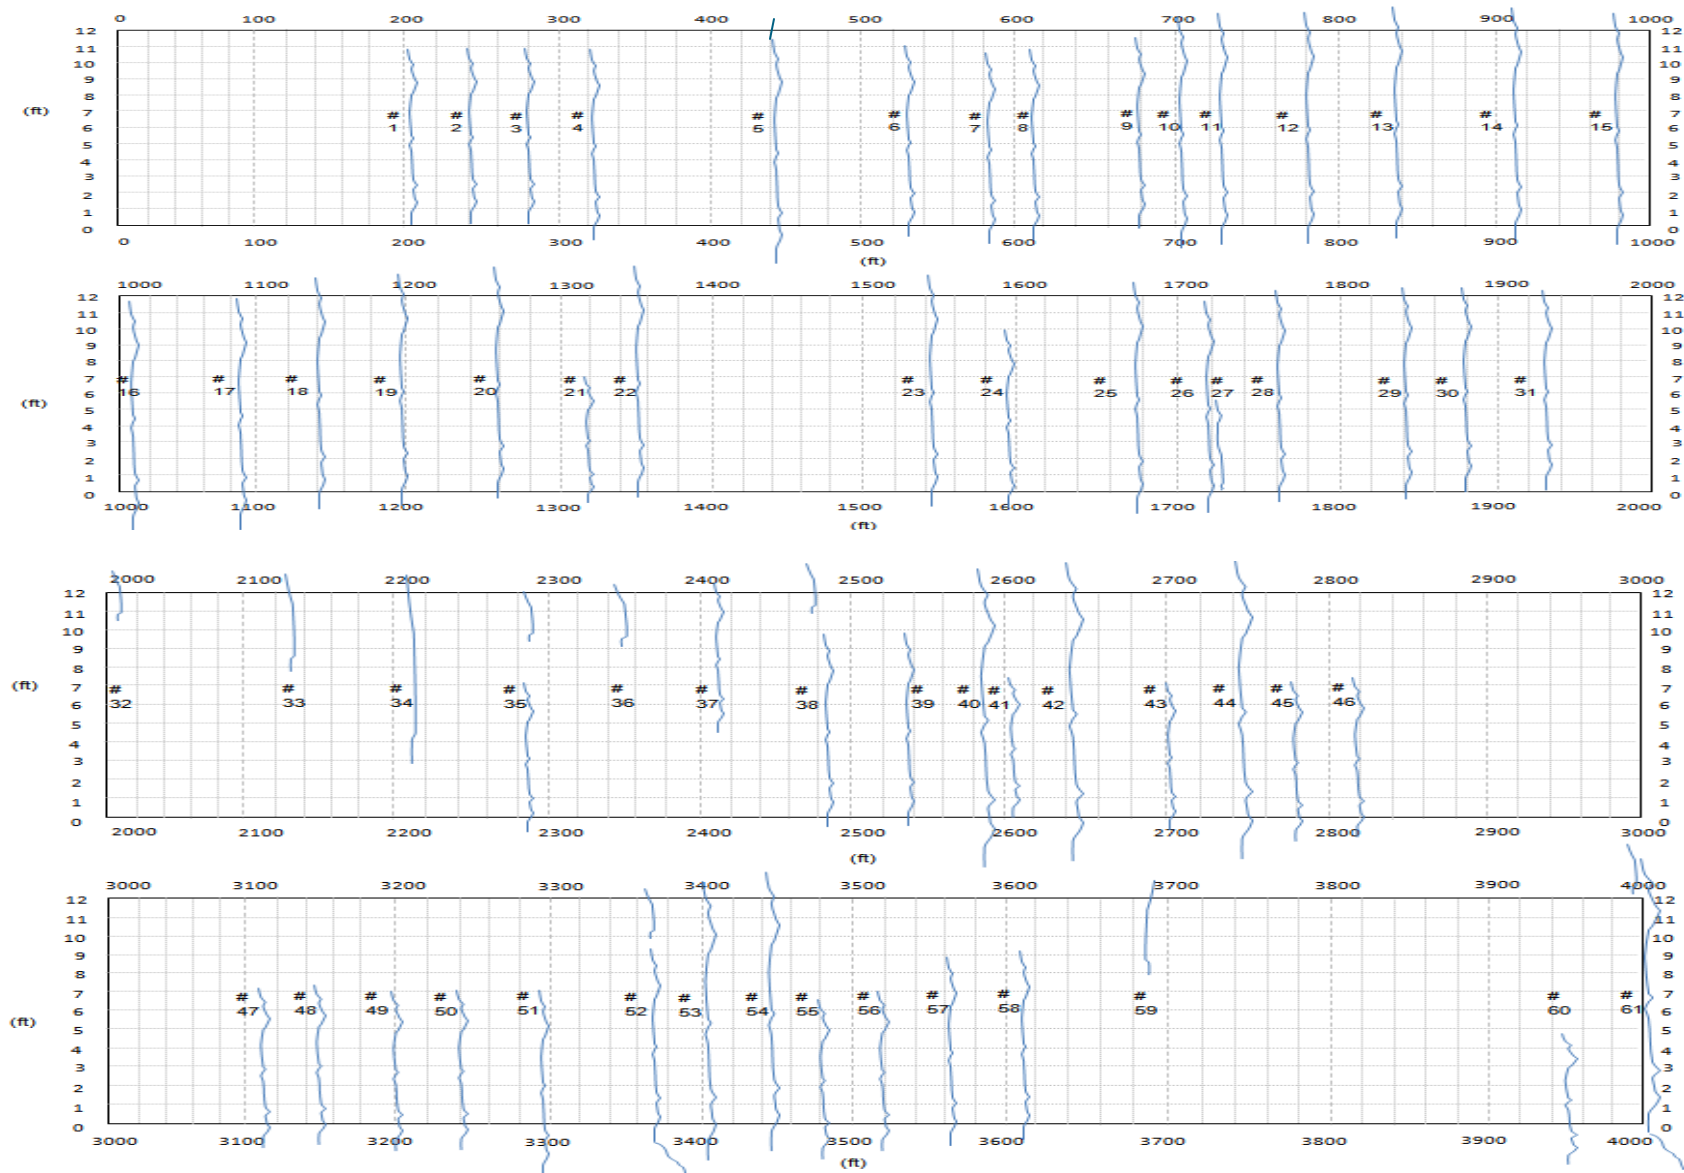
Cracking Map of SH 24 Test Section before Asphalt Overlay Construction.
